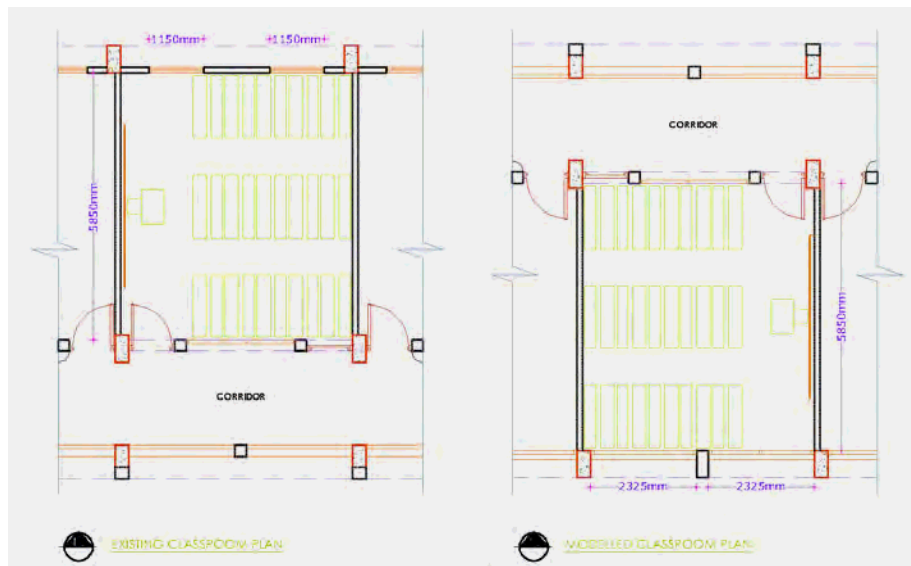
Plan of existing and modelled classroom at Paik para Government Staff Quarter Primary School
